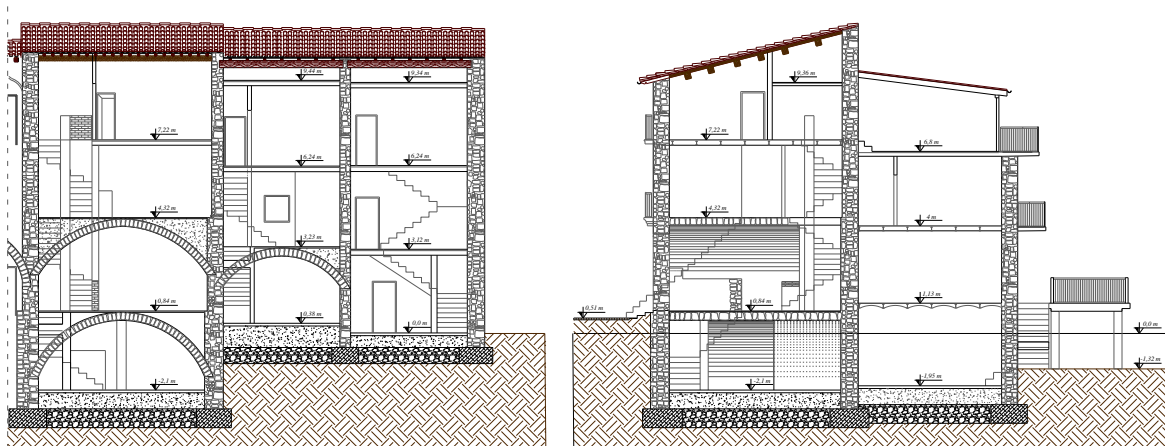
Extract of longitudinal section and cross-section of s.u.8 of aggregate 10-088⁵.
